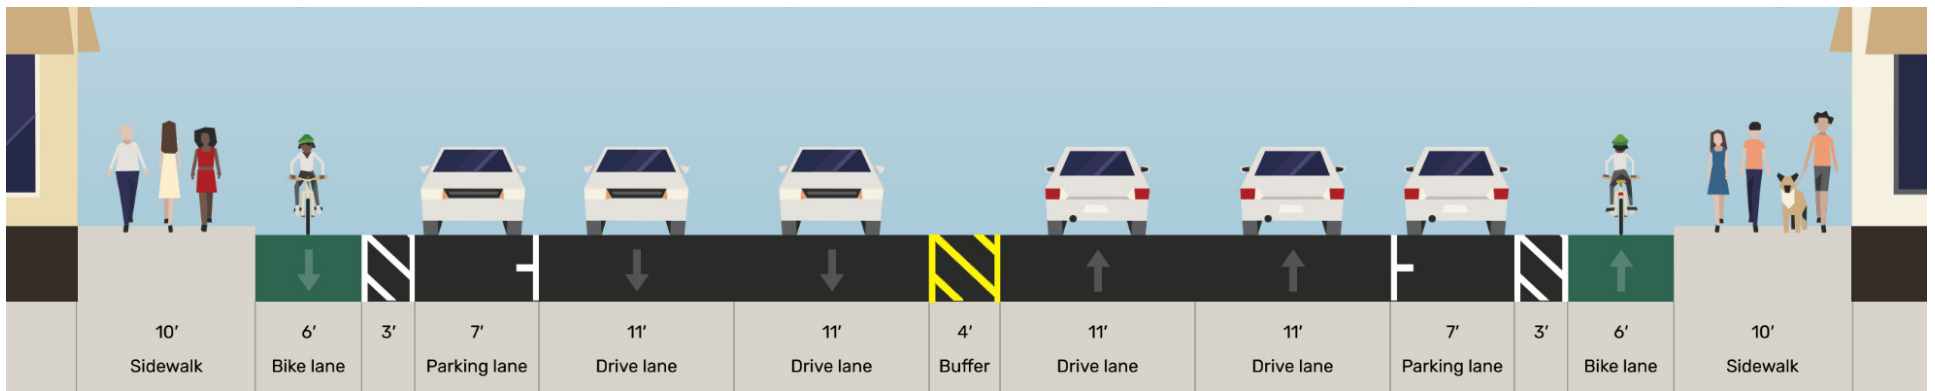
Proposed cross-section: Rosecrans Ave from Prairie Ave to Crenshaw Blvd
